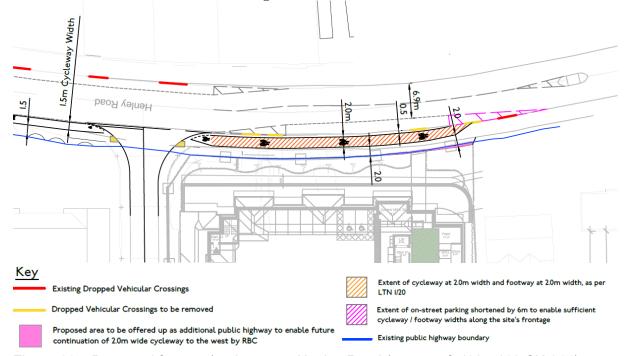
Proposed footway/cycleway on Henley Road (extract of J32-5410-SK-011)
